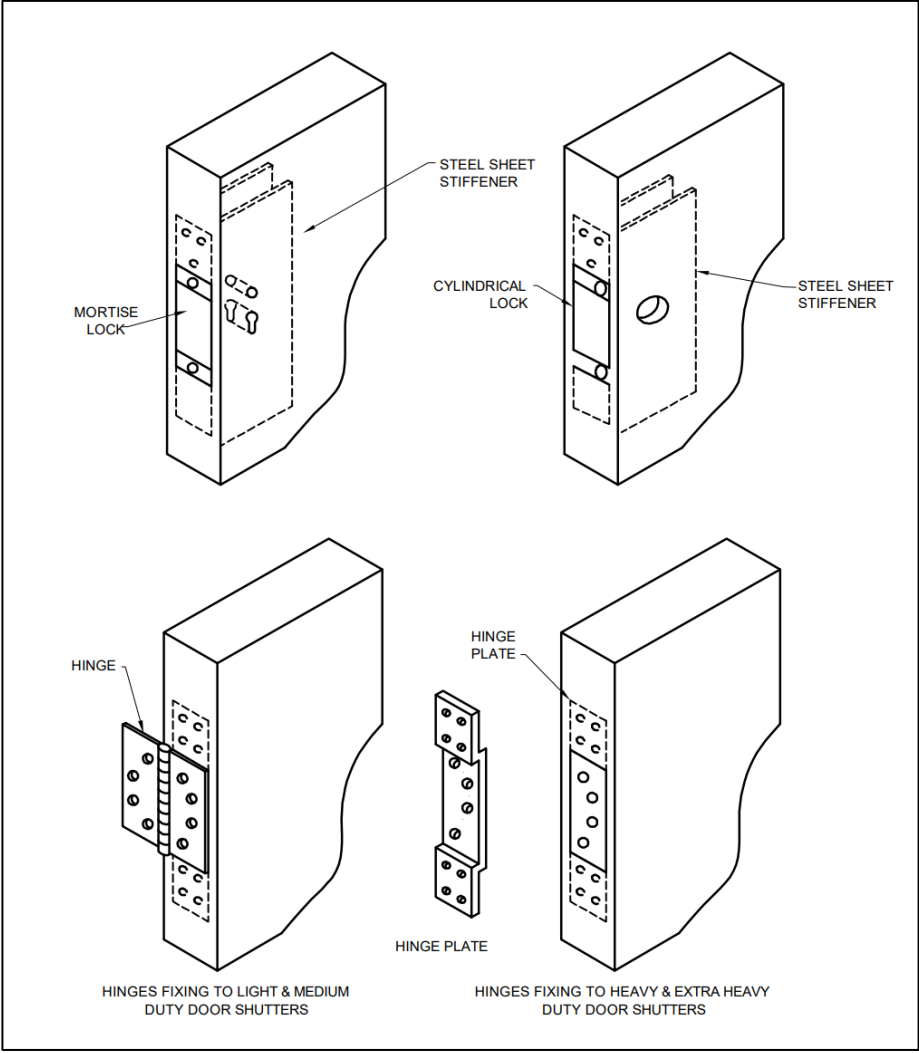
HINGE AND LOCK REINFORCEMENT.
